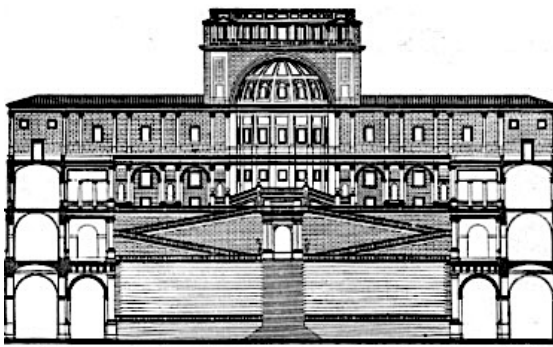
(above left) Belvedere elevation (Image: <http://gardenvisit.com>)
